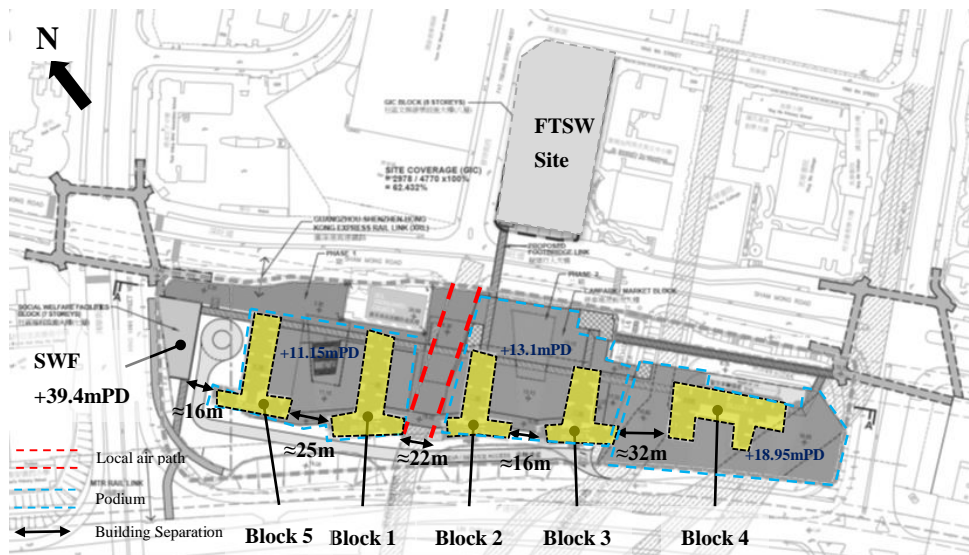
Master layout plan of Baseline Scheme for NWKR Site 6
